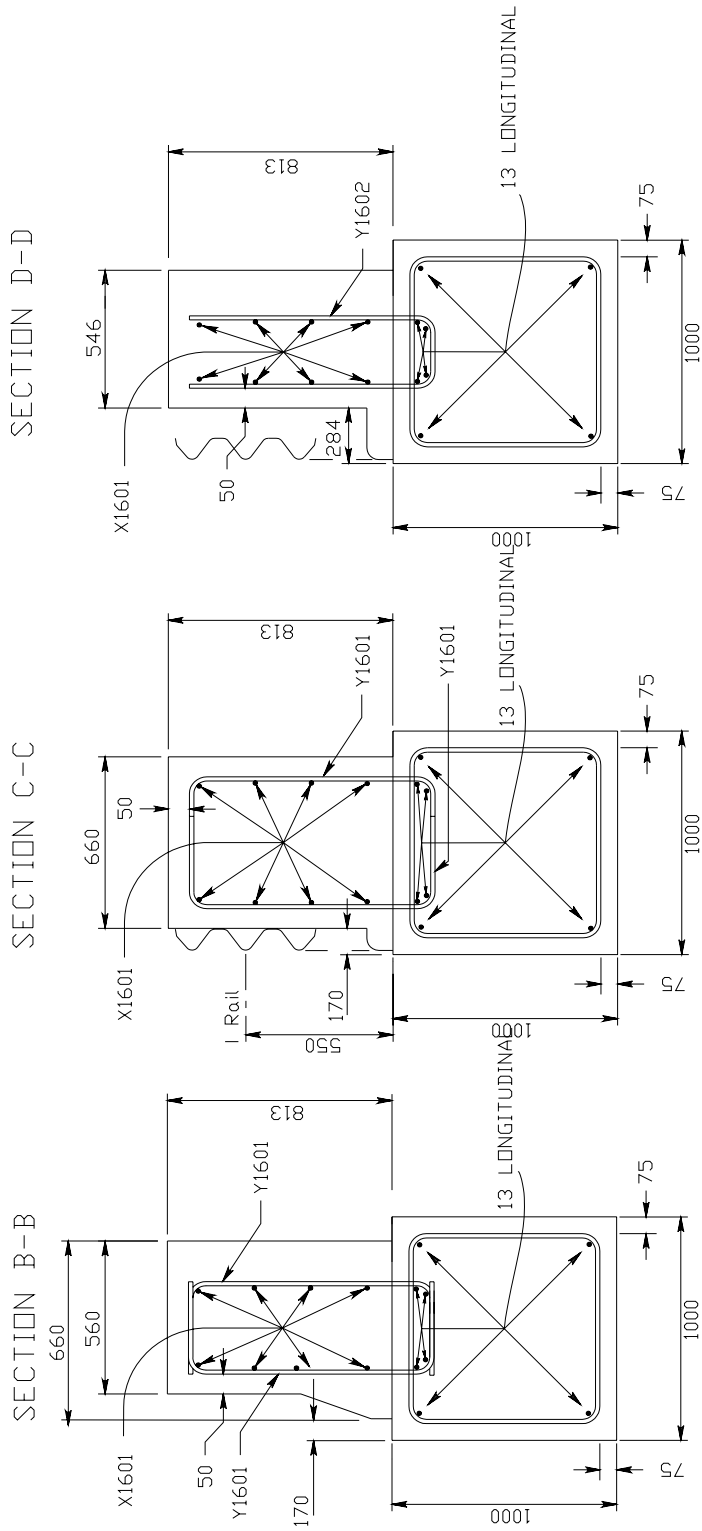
Details of the Ohio Type 1 thrie beam transition with asphalt curb—sections B-B, C-C, and D-D.
